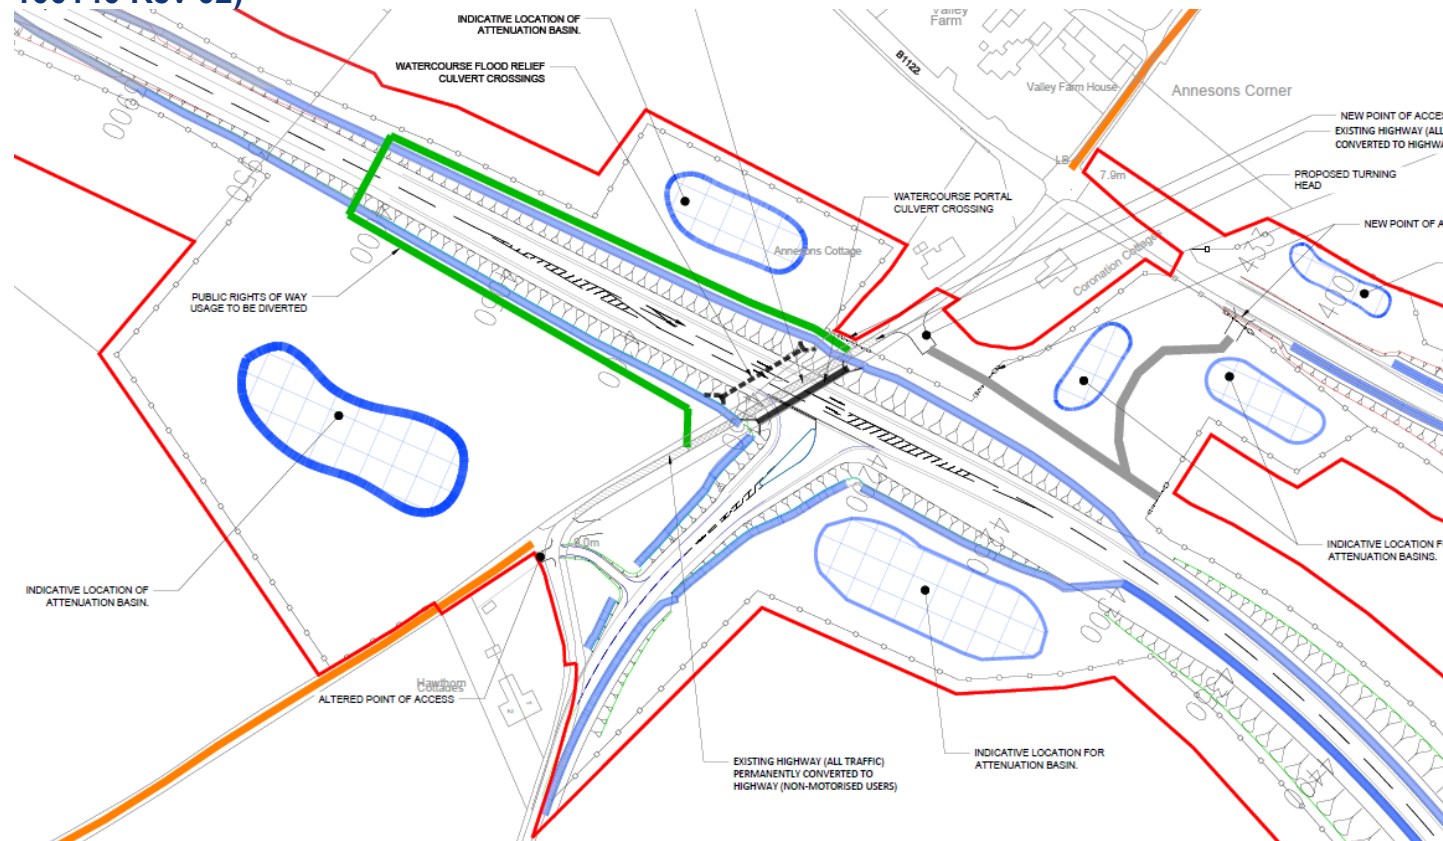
Indicative location of the attenuation basins at crossing 4 (Extract from drawing no. SZC-SZ0204-XX-000-DRW-100066 Rev 02)
